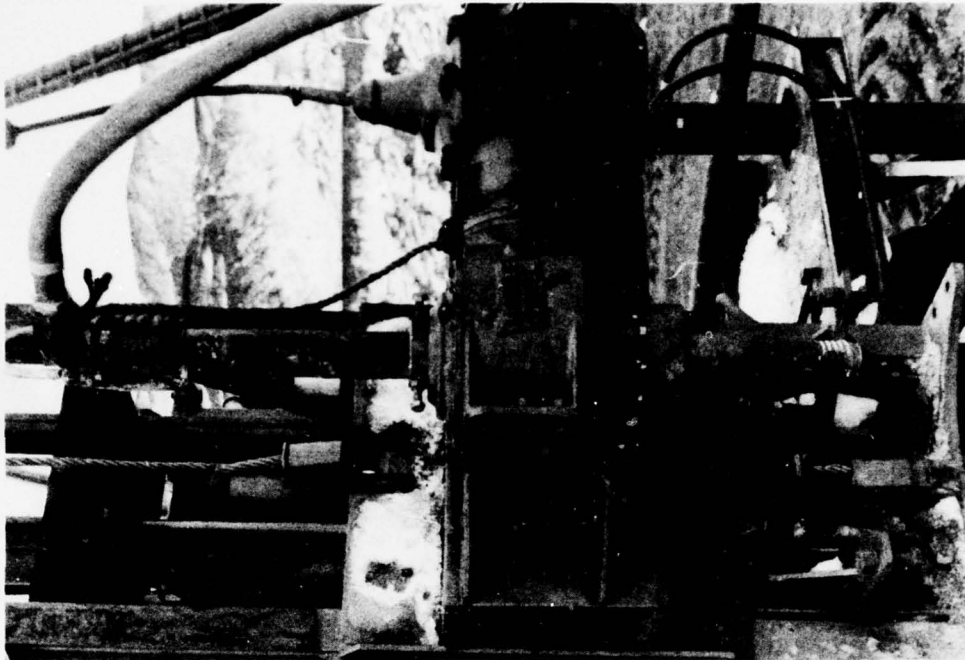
Drive head of Mobile Drill set up for fluid drilling.
